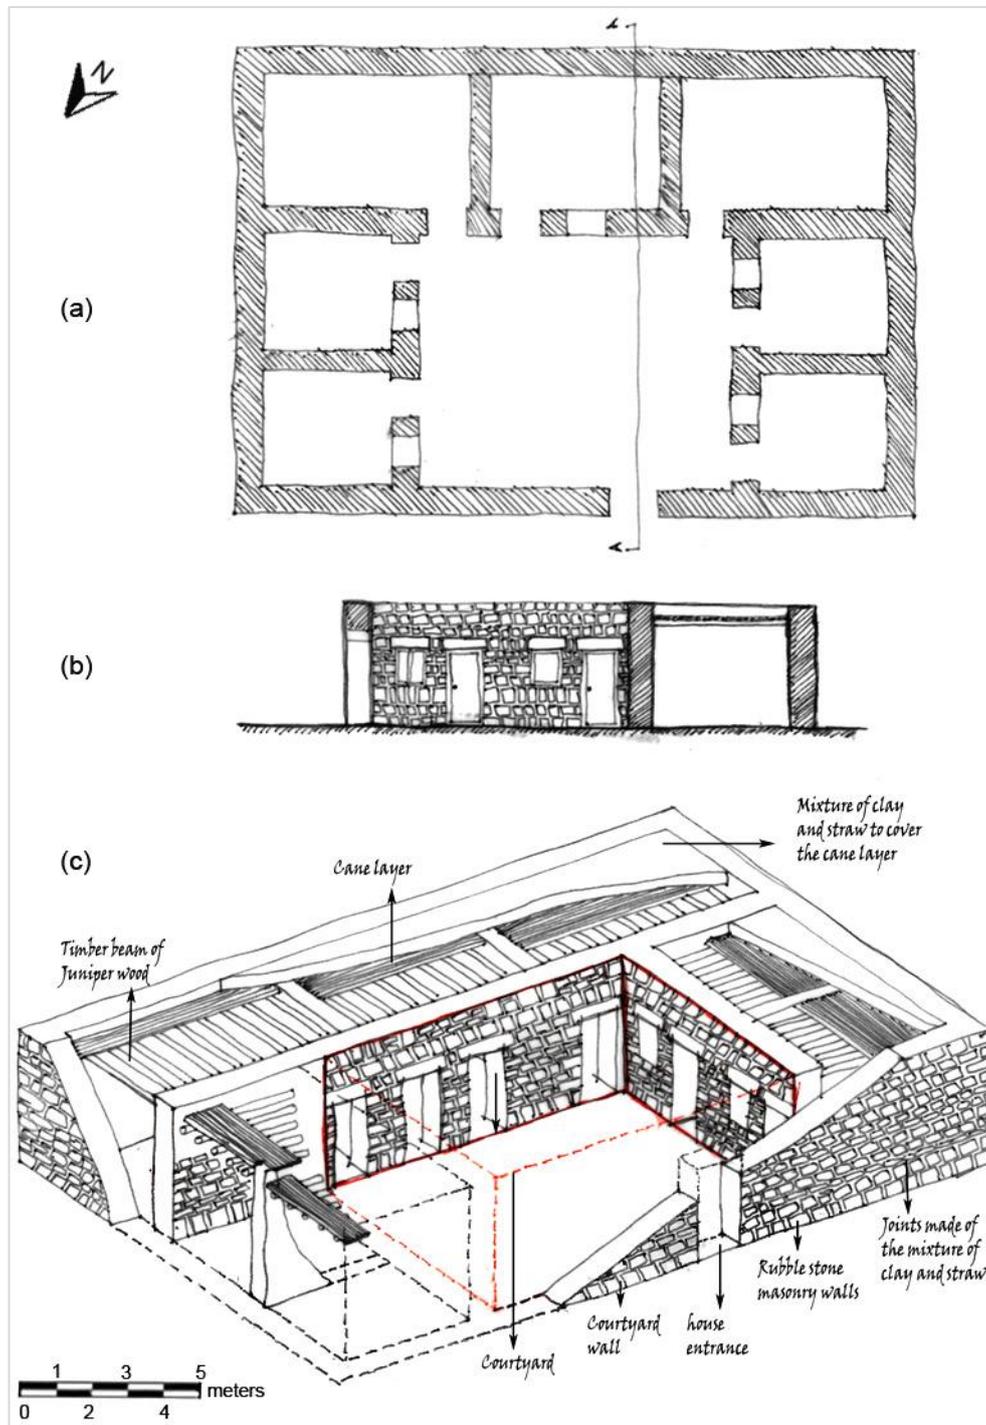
House C, an example of a courtyard house: (a) plan; (b) section; (c) axonometric (Author 2019)
